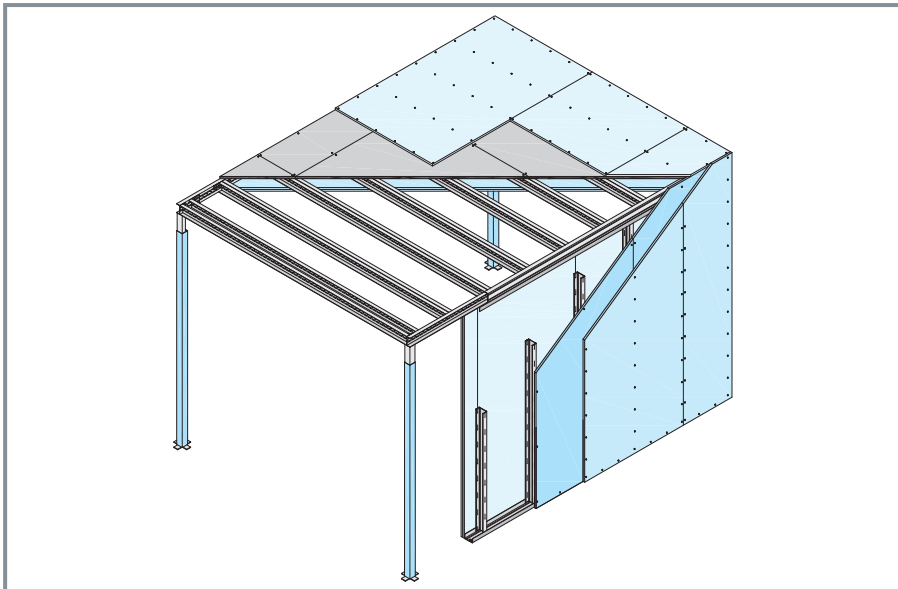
illustrates the basic load bearing system with columns to transfer the vertical forces and circumferential perimeter profiles to accommodate the ceiling structure and to transfer the ceiling loads in the columns as well as for the purpose of fixing the wall frames.
